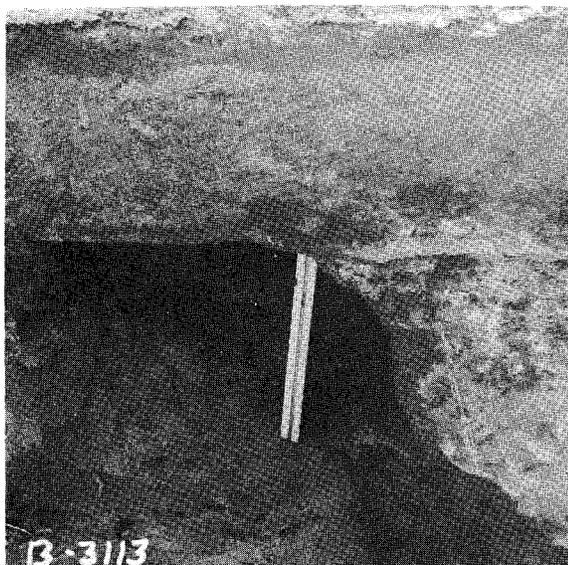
Void behind anchor lug due to movement of the anchor system. The anchor slab is at the top of the picture and the lug is to the right. Camp Strake Road Overpass.
